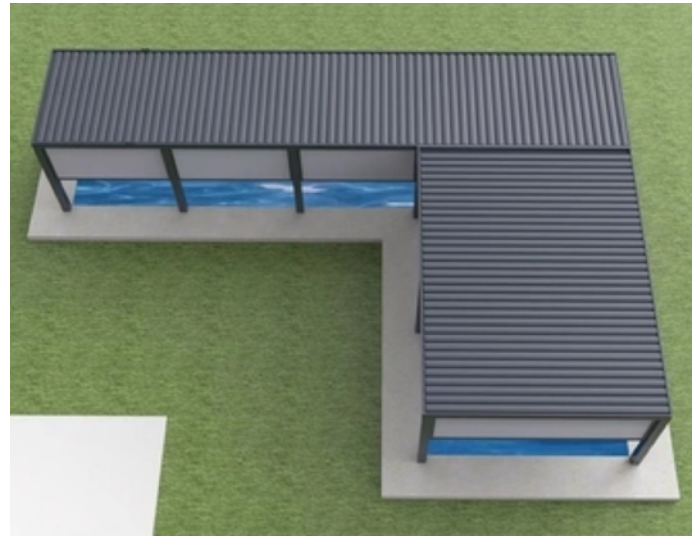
A Modern pergola with aluminium frame and Louvred rooftop
